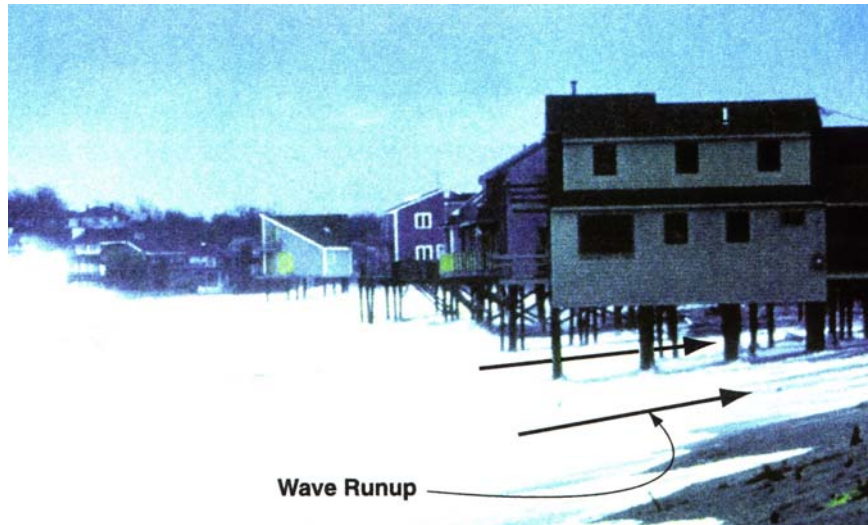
Erosion due to wave runup under elevated buildings in Scituate, Massachusetts (Photograph by Jim O'Connell).
